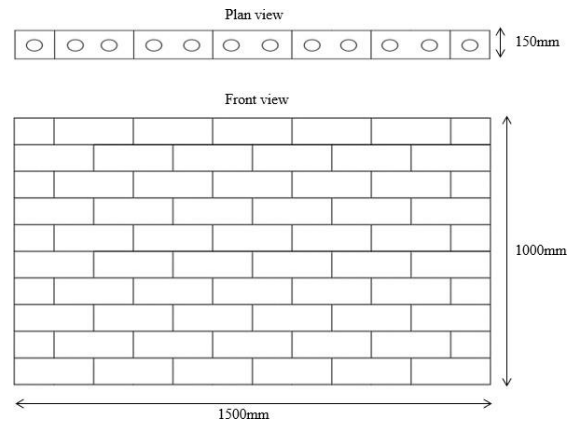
Interlocking soil-cement hollow block wall dimension.
